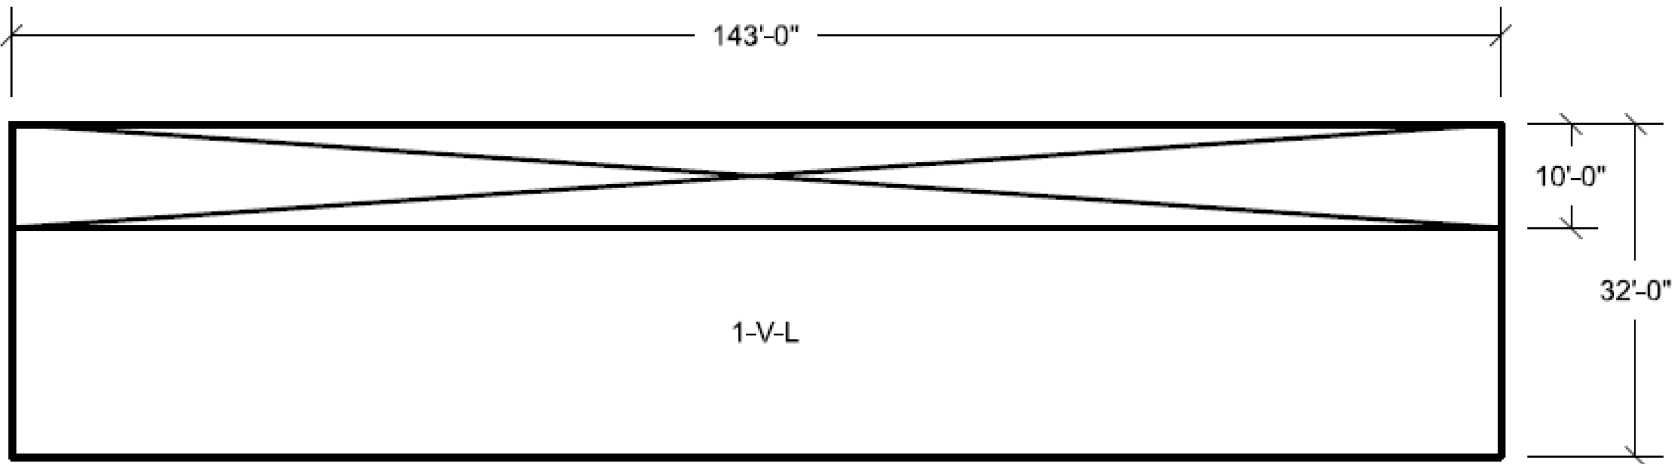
H.6-64 Pump House South Wall Looking South Vertical Reinforcement Zones Far Side Face
